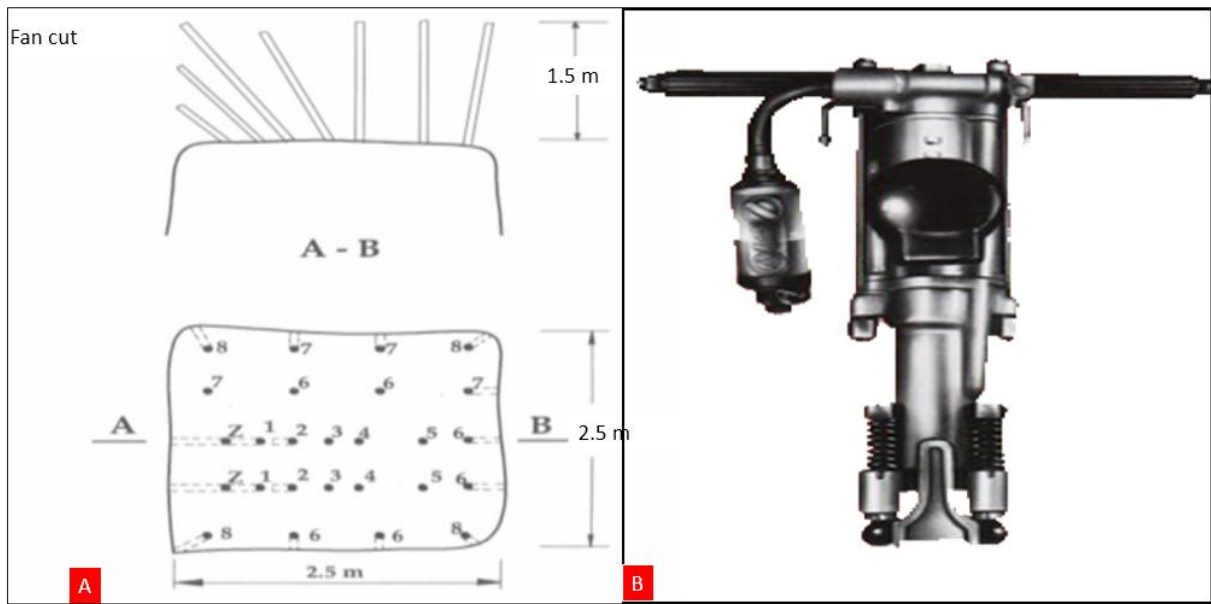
A) Fan cut drilling and blasting applicable to Masagalu project, B) A typical handheld drilling machine for the Masagalu project.
